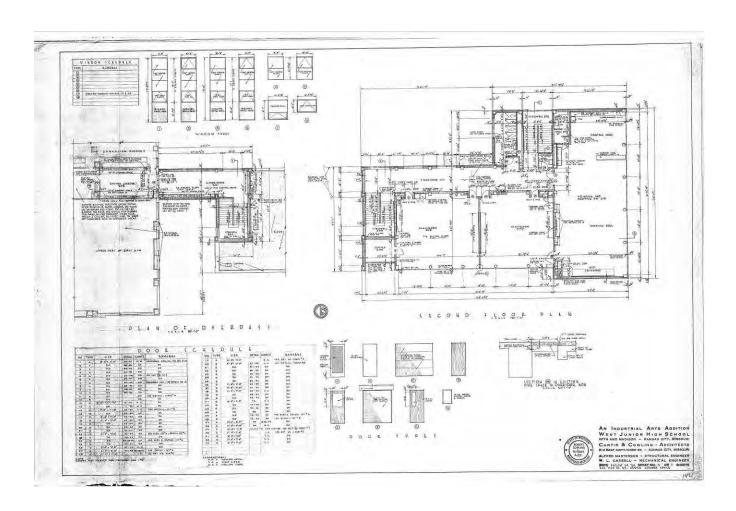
West Side Jr. High: Industrial Arts Addition 1954: Second Floor Plan Curtis and Cowling, architects
